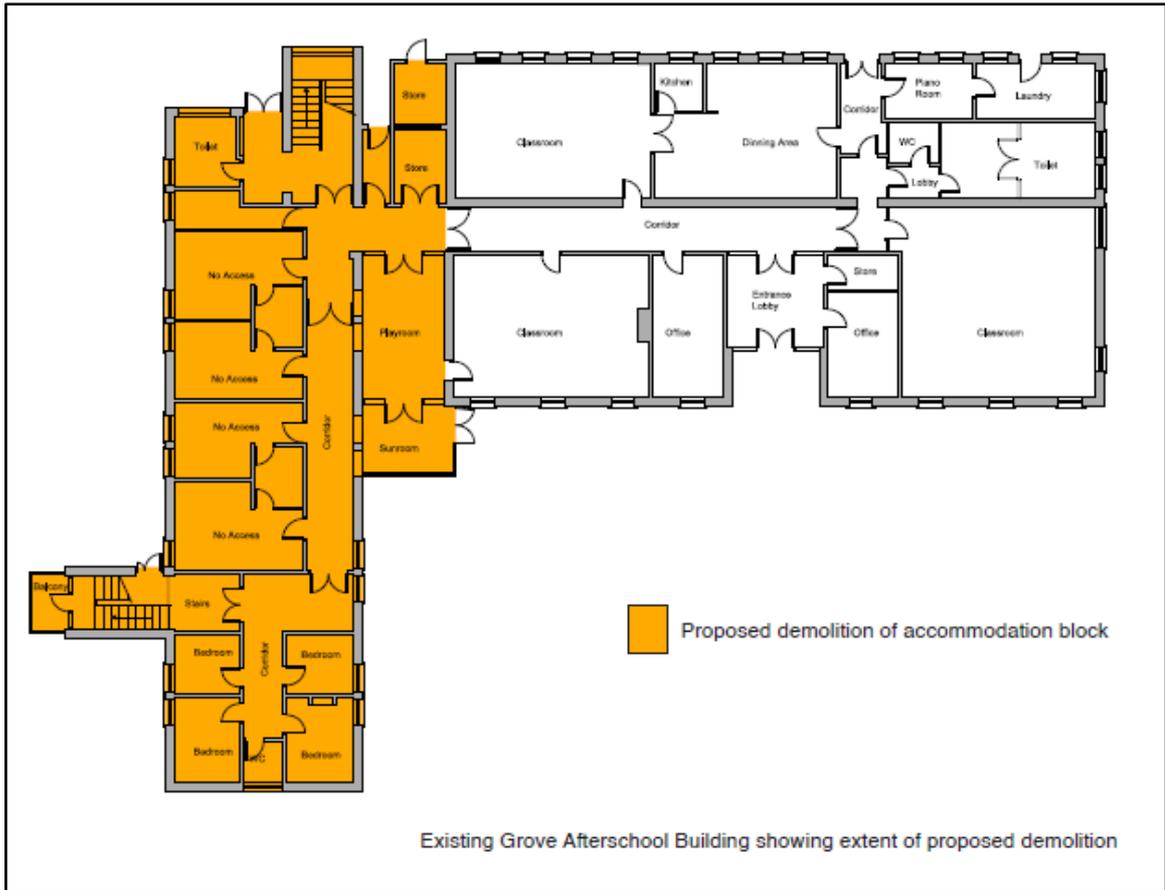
Floor Plan Showing the Proposed Demolition of the Disused Portion of the Goatstown Afterschool Building
